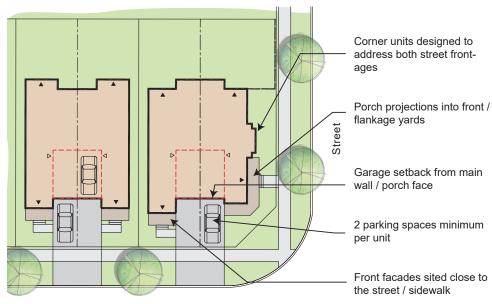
Conceptual plan layout for semi-detached dwellings
